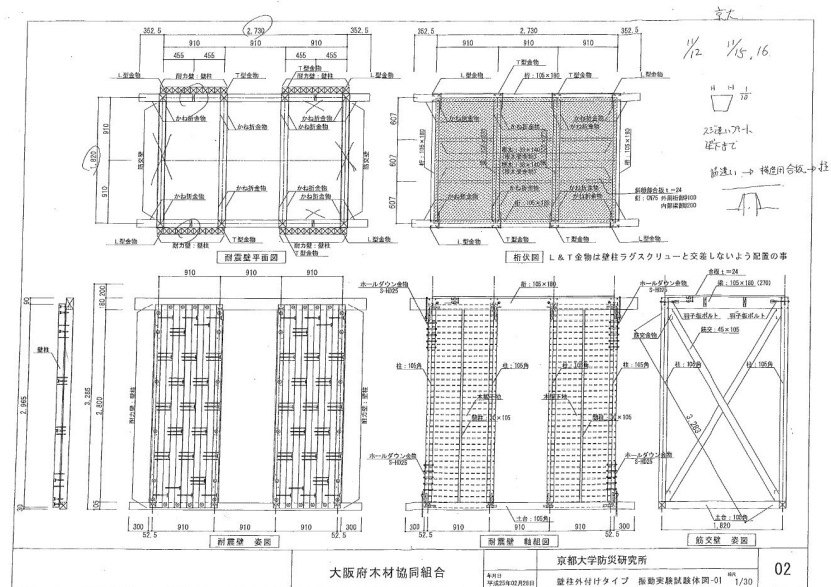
Mechanical plan of the wood frame with wall of column reinforcement
